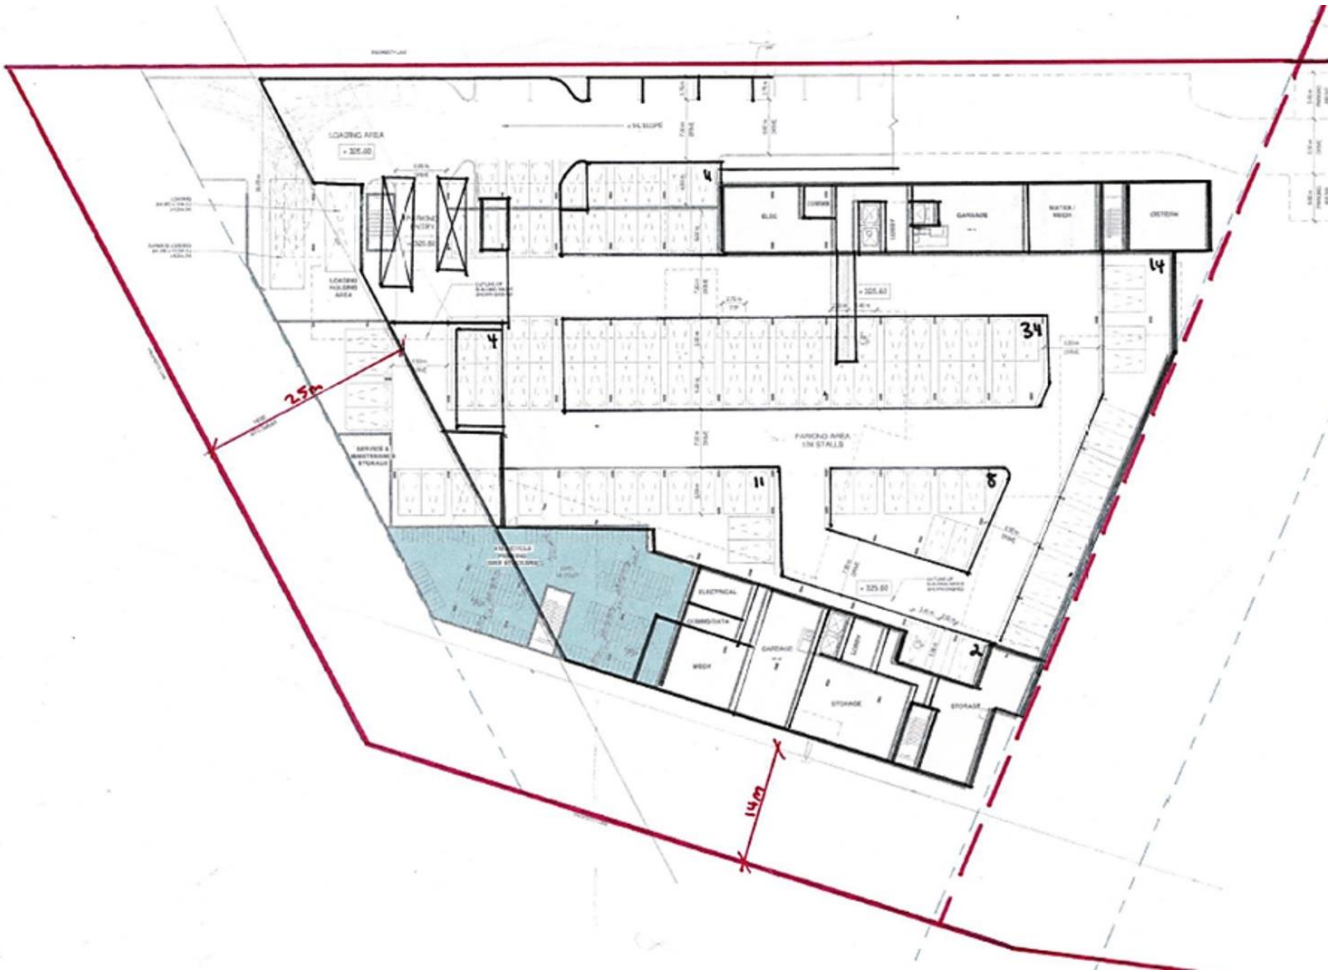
Conceptually Revised Typical Floor Plan and Site Plan
